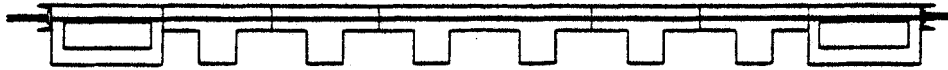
End view cross-section of a stress-laminated SCL T-beam bridge.
